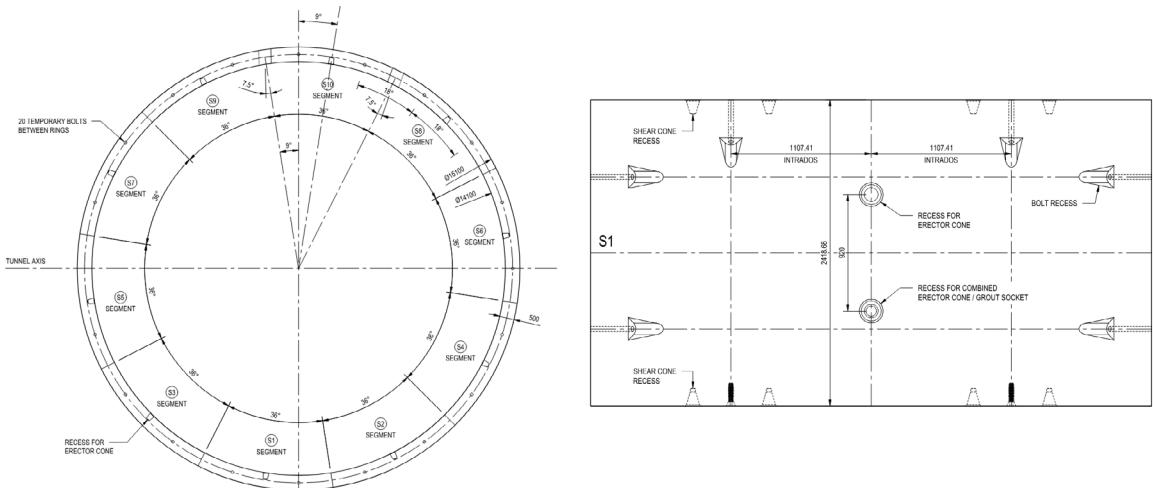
Elevation of erected ring (left) and developed view for a typical segment (right).
